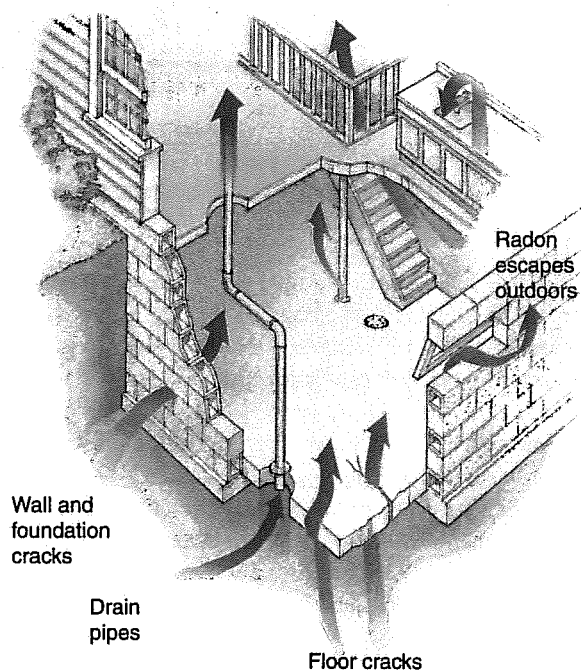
Household radon infiltration. Cracks in basement walls or floors, openings around pipes, and pores in concrete blocks provide some of the entries for radon.
